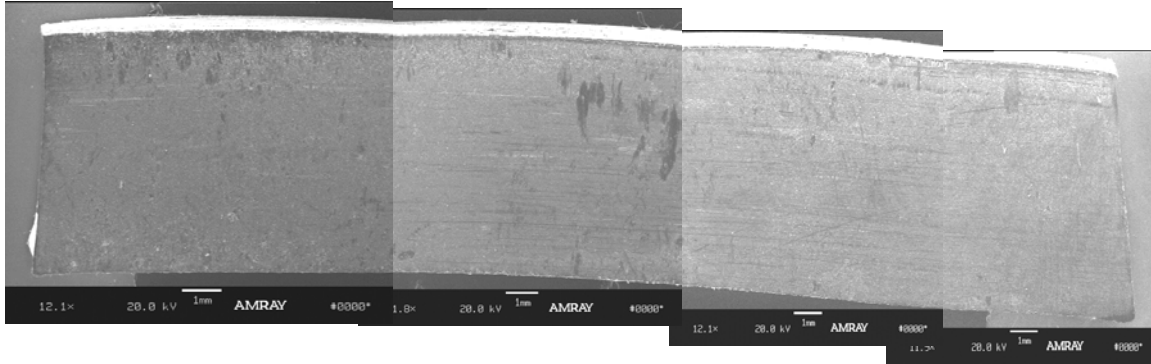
General view of the fracture surface of Specimen 2 from Span Sample 124-NB-T3-SEG4-N
